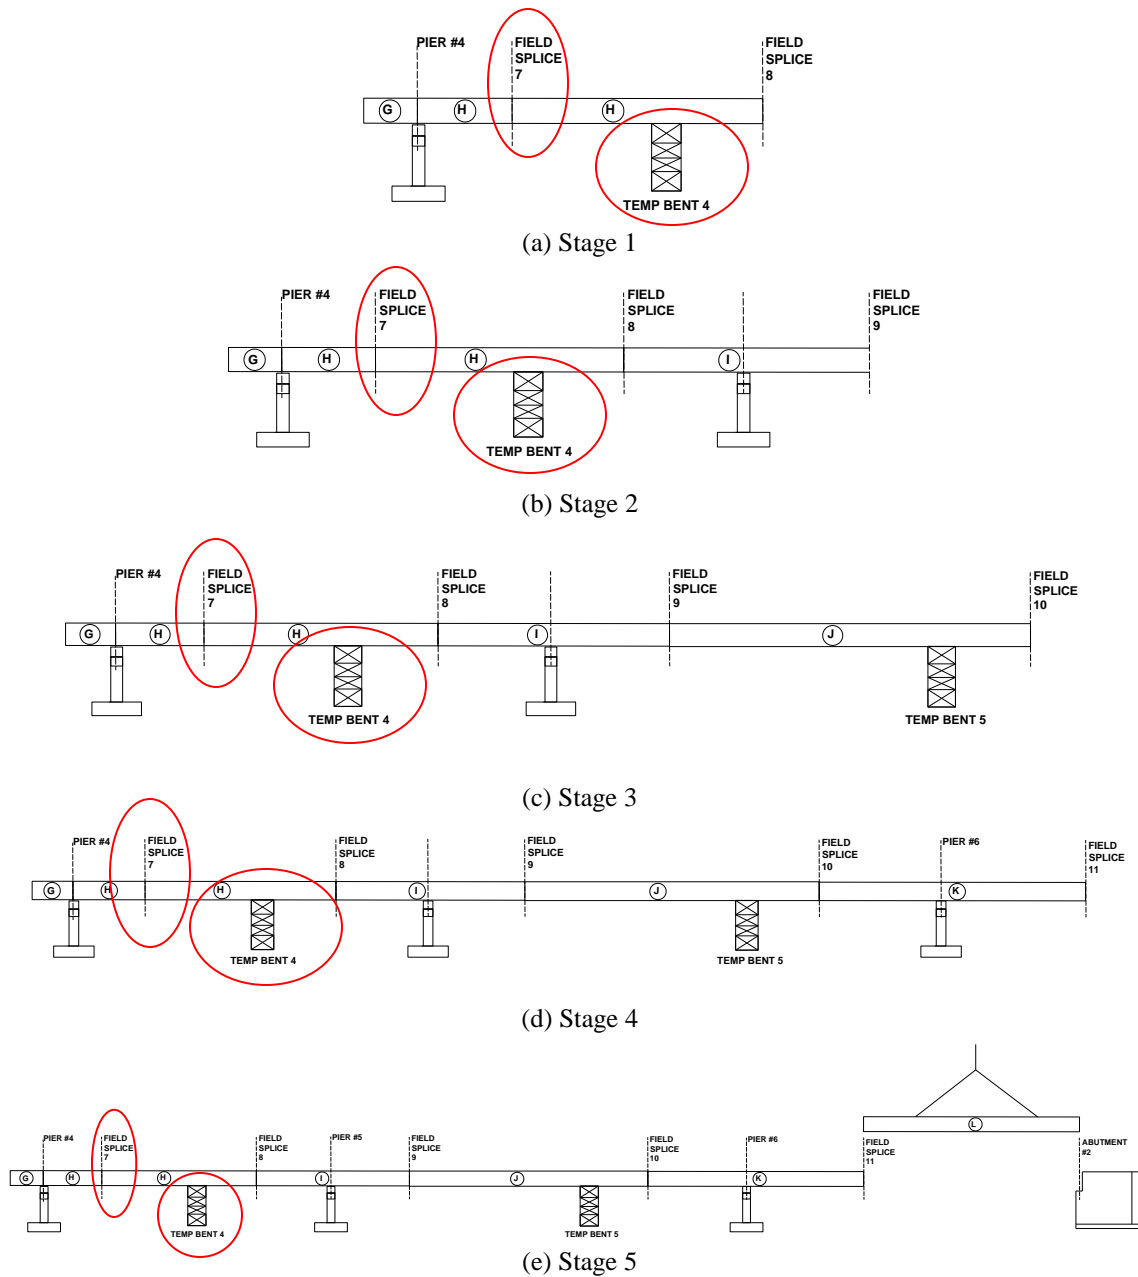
Unit 2, Girder Erection Details, Missing Ramps Bridge.
